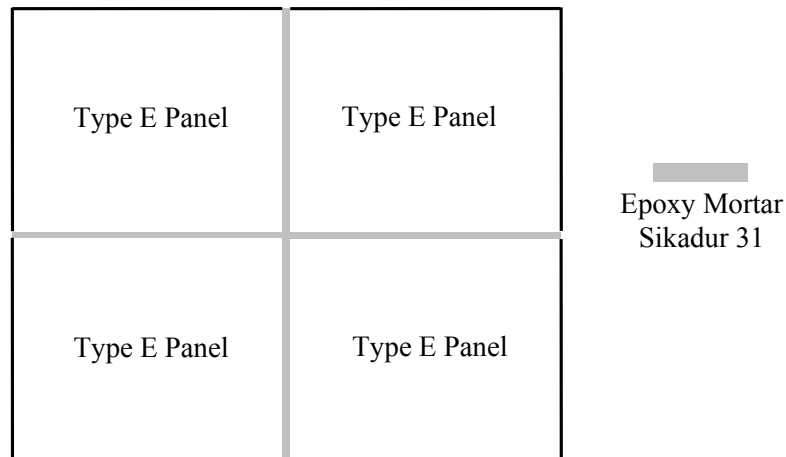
Panel-to-panel connection details, Specimen CEE4
